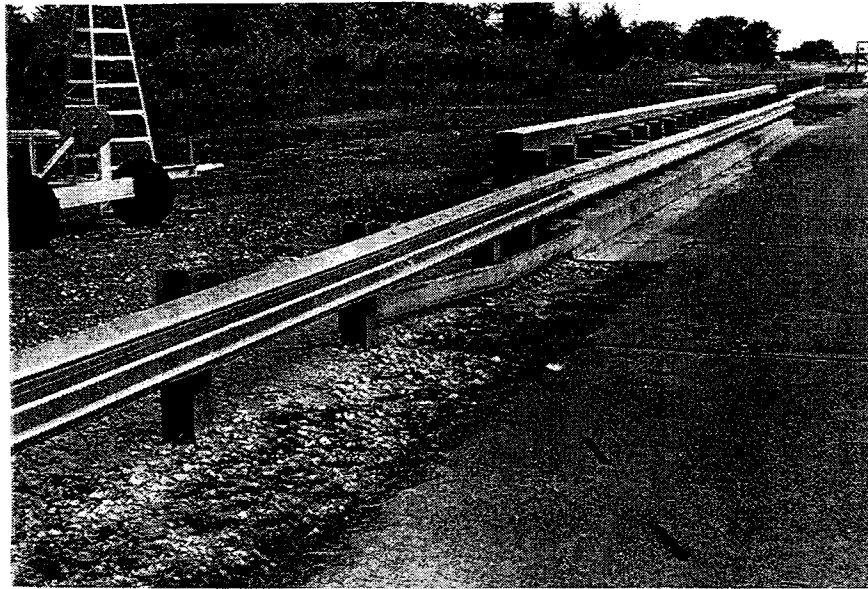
W-beam retrofit transition used for tests 472070-3 and 4.
